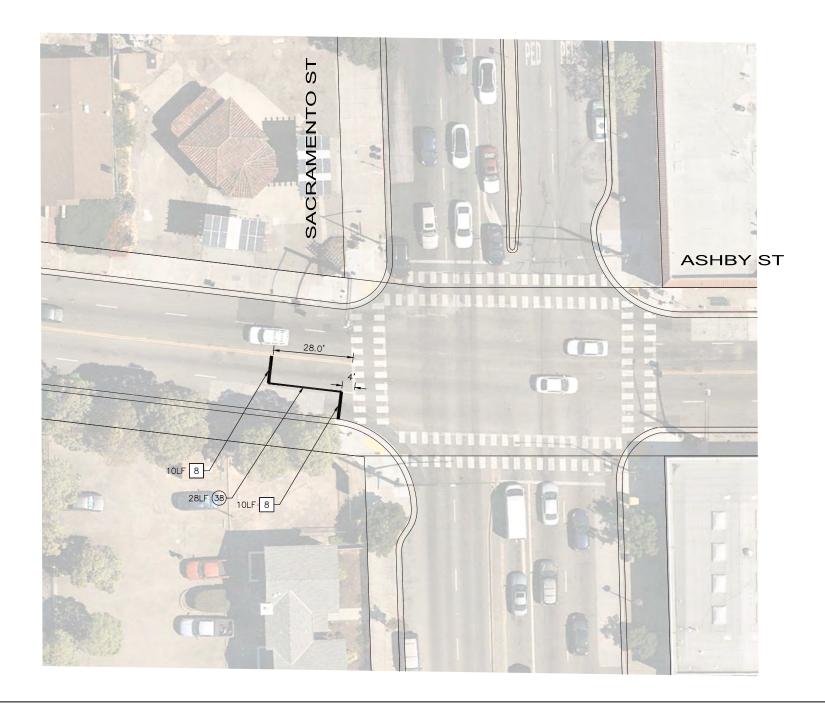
Ashby Avenue and Sacramento Street Intersection Proposed Configuration
